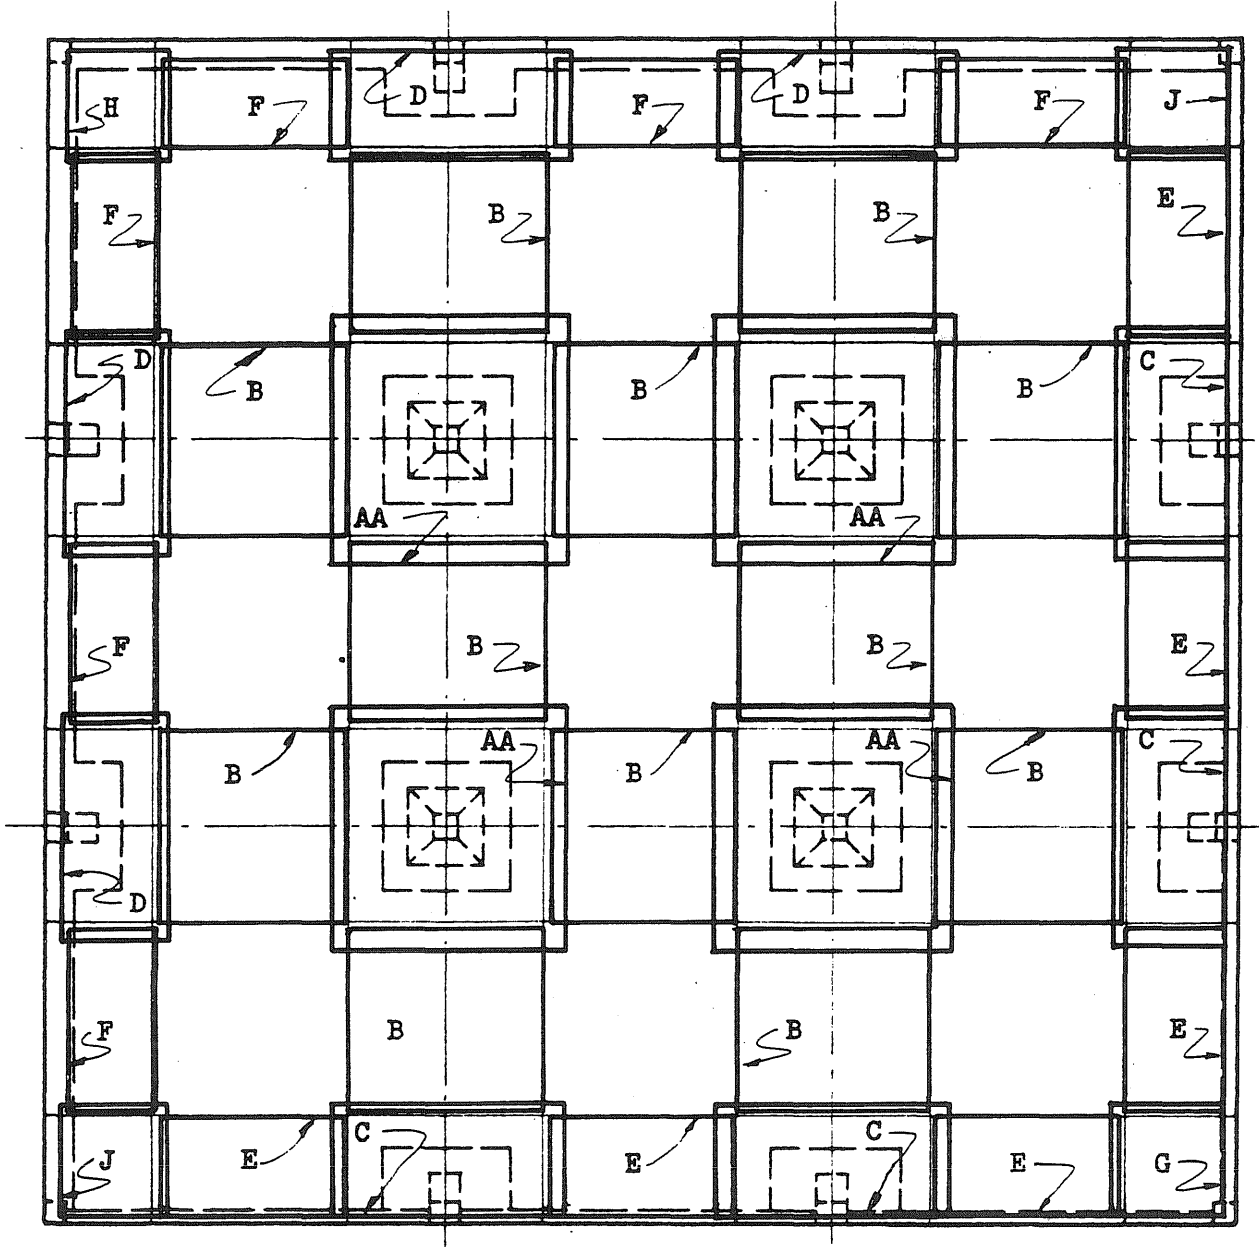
(a) ARRANGEMENT OF WELDED WIRE FABRIC TOP REINFORCEMENT
